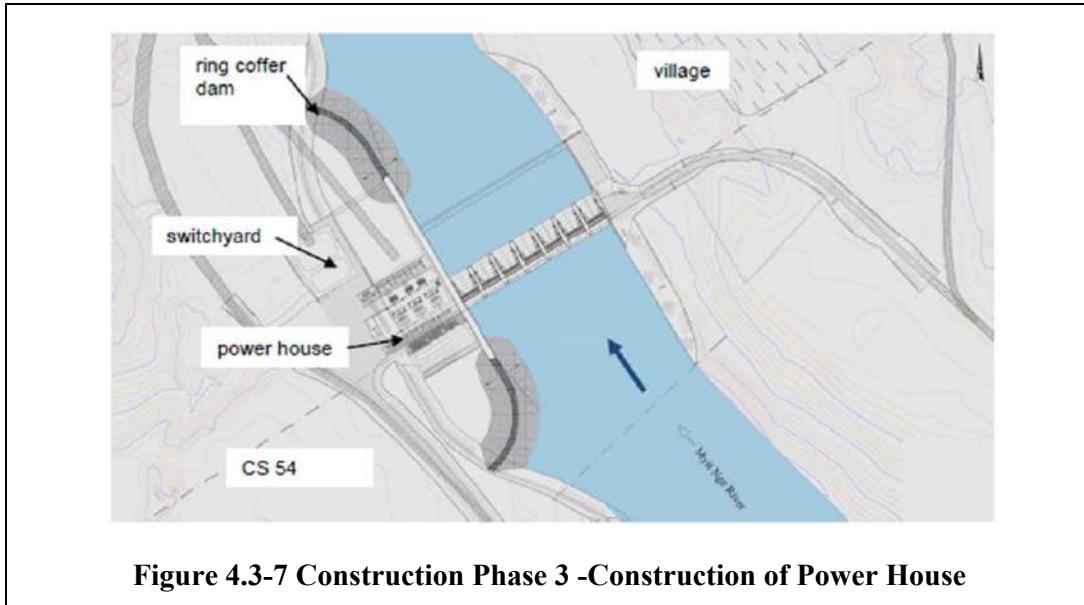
Construction Phase 3 -Construction of Power House
